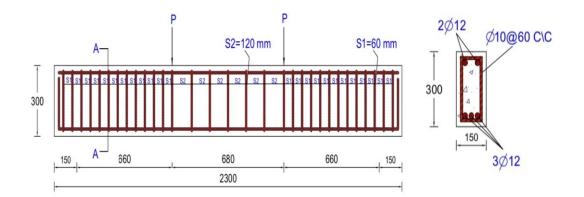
The Details of Reinforcement and Method of Loading for Concrete. Beams.
